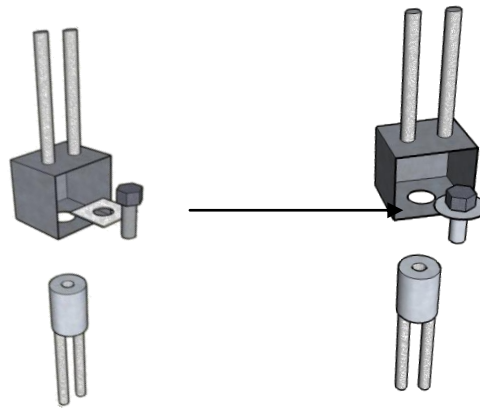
Sketch of floor-to-wall connection, before and after part reduction.
